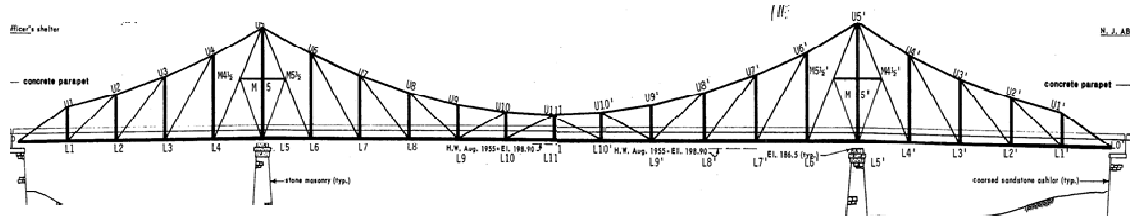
The side view of the Northampton Bridge provided by Bridge Inspection Plans report
